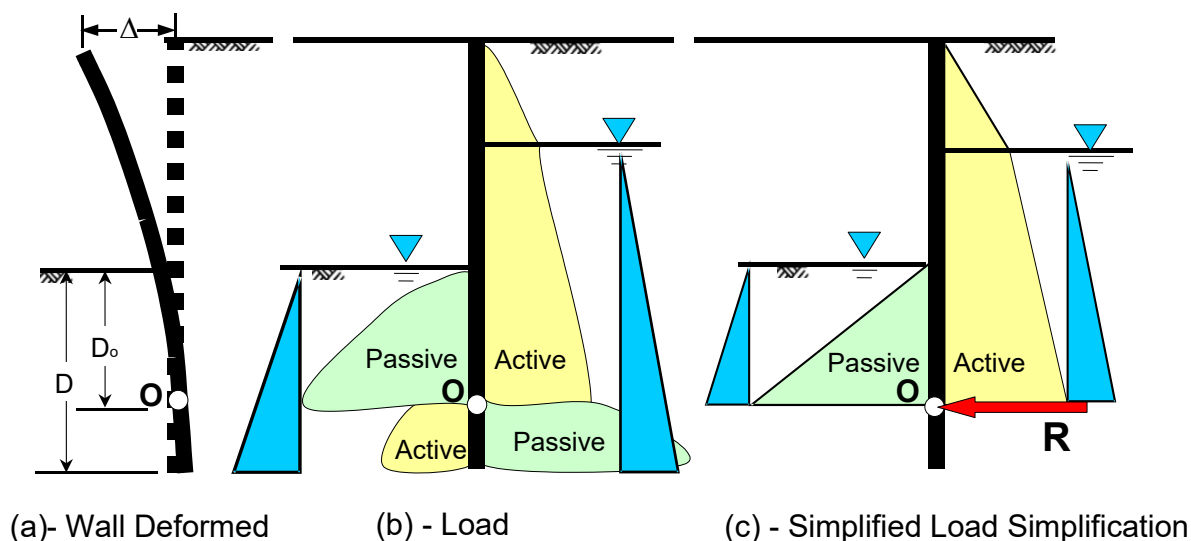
Cantilever Sheet Pile Walls Idealized Loading Diagram
